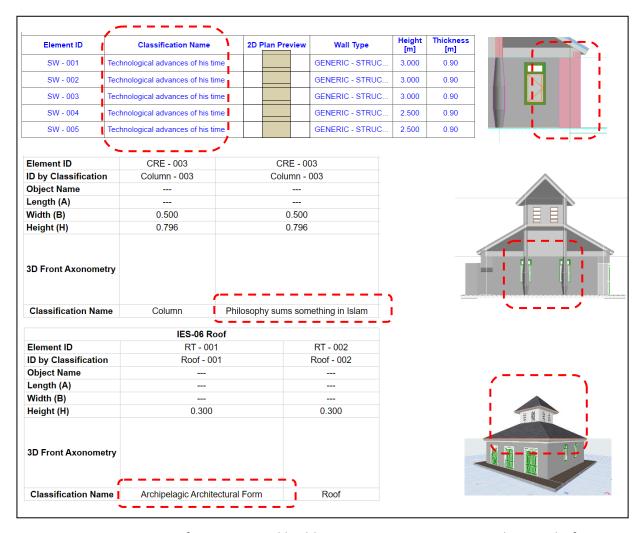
Meaning of structure and building construction in HBIM ArchiCAD platform
